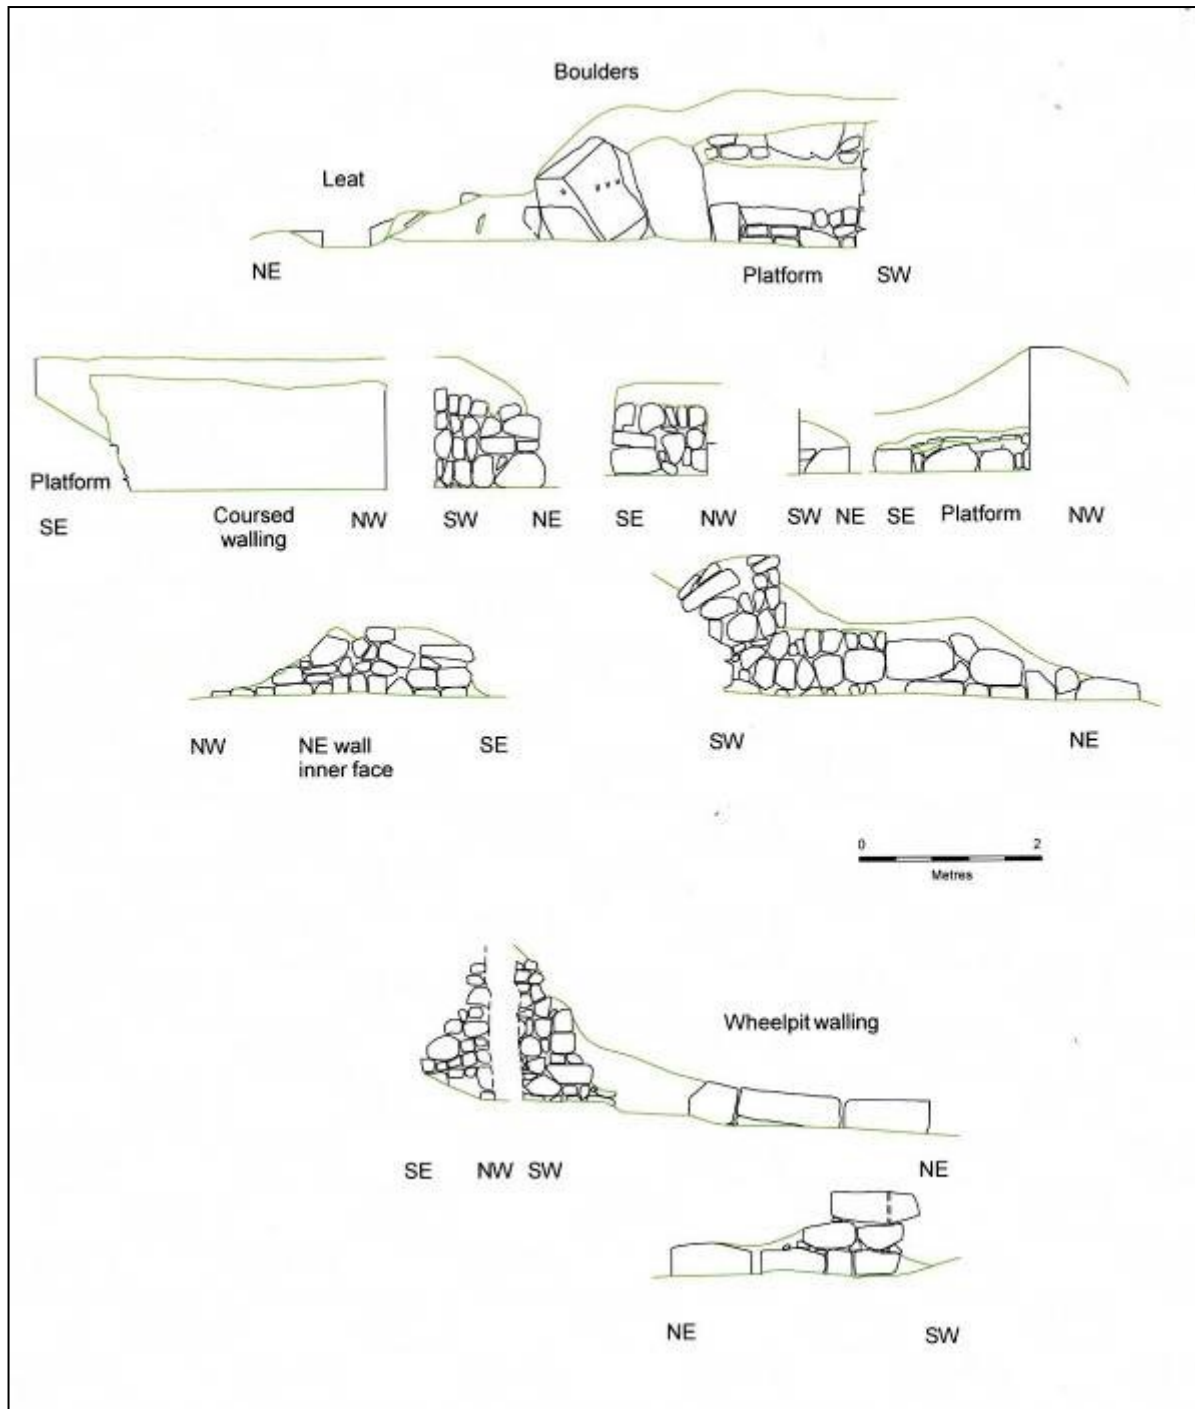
Internal elevations of the Little Stamps site walls and the remains of its wheelpit. Fig 14 includes the plan of this site component.
